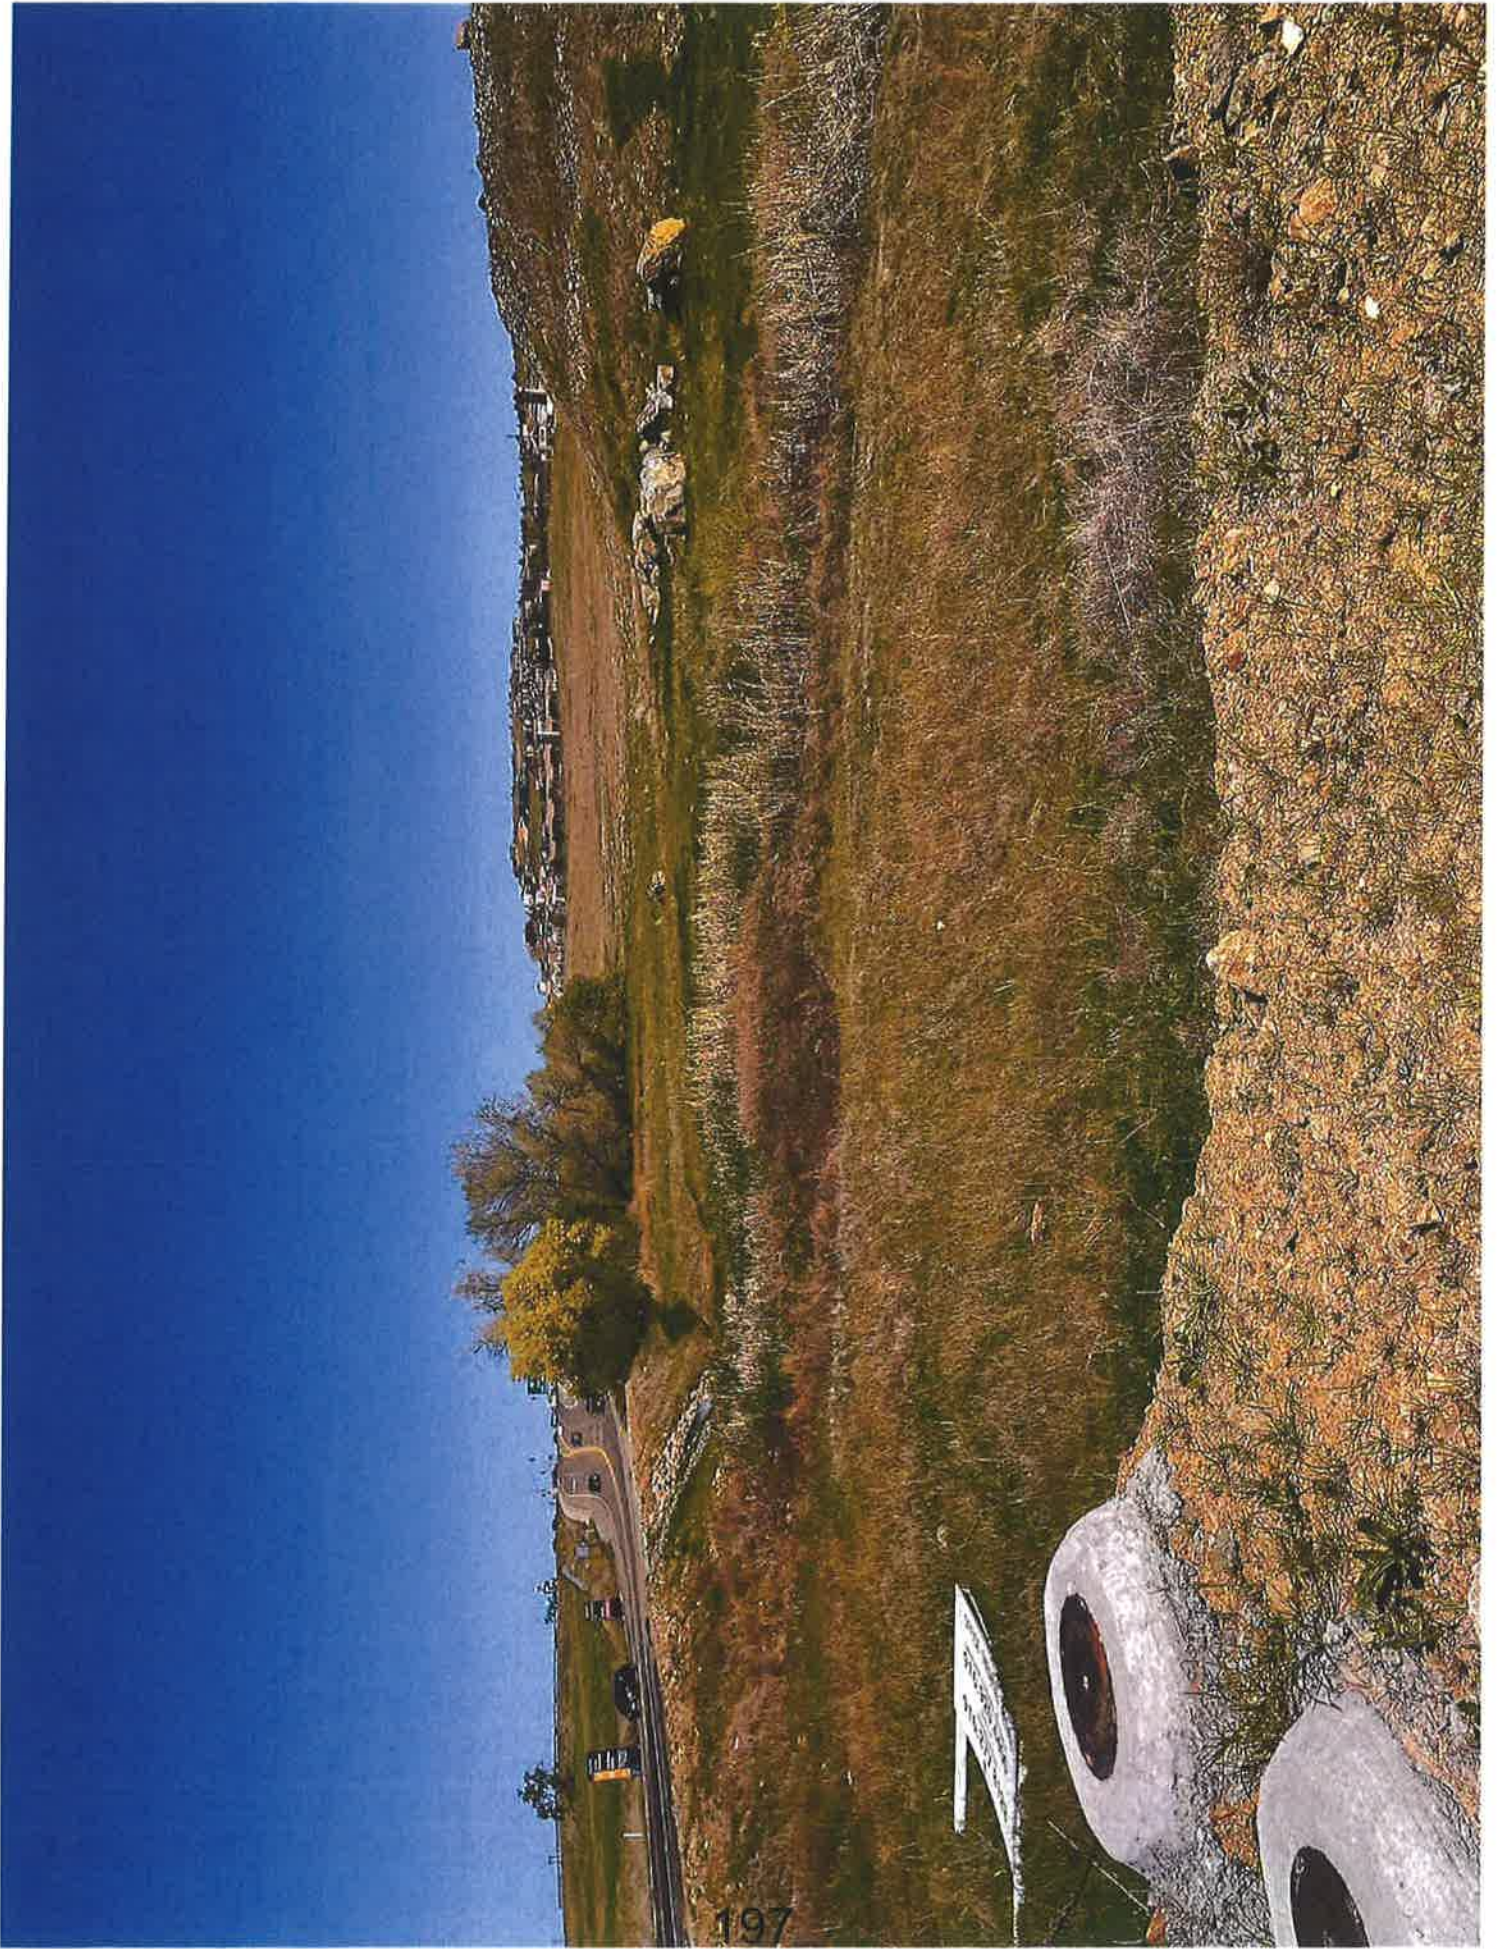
EXHIBIT F - STREET LIGHTING AND LANDSCAPING FRONTAGE
